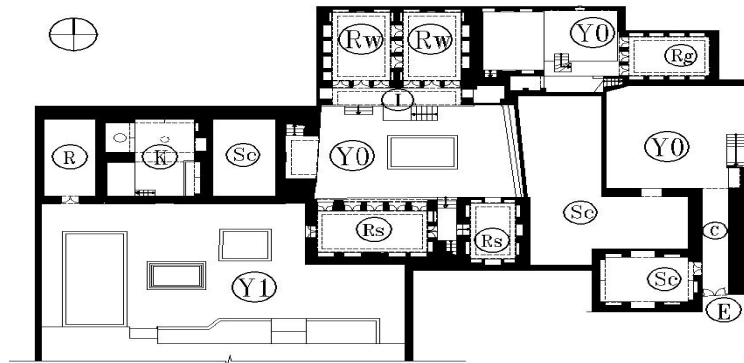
The Architectural Plan of Nazemian House in Semnan (MCTH, 2020)
